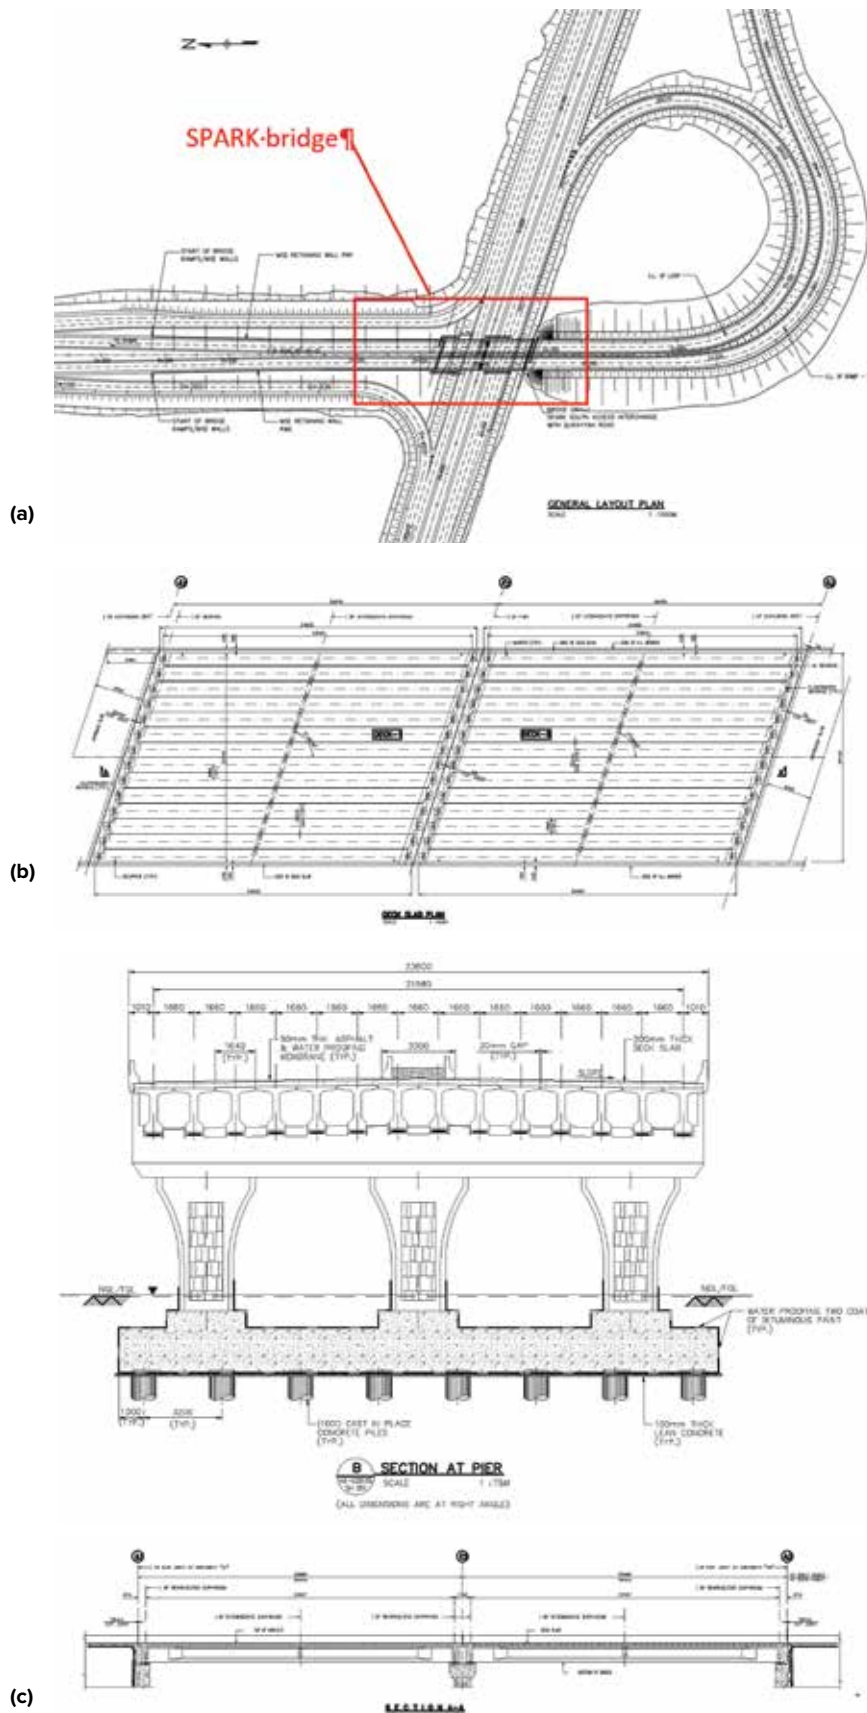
Bridge design drawings: (a) project master plan; (b) bridge plan view; and (c) bridge section view (from Reference 10)
